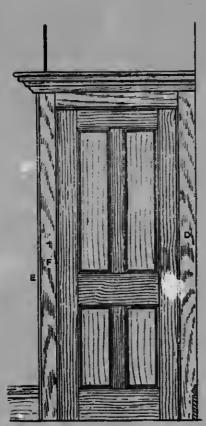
Front Elevation of Dress Cupboard for Bedroom Recess.
